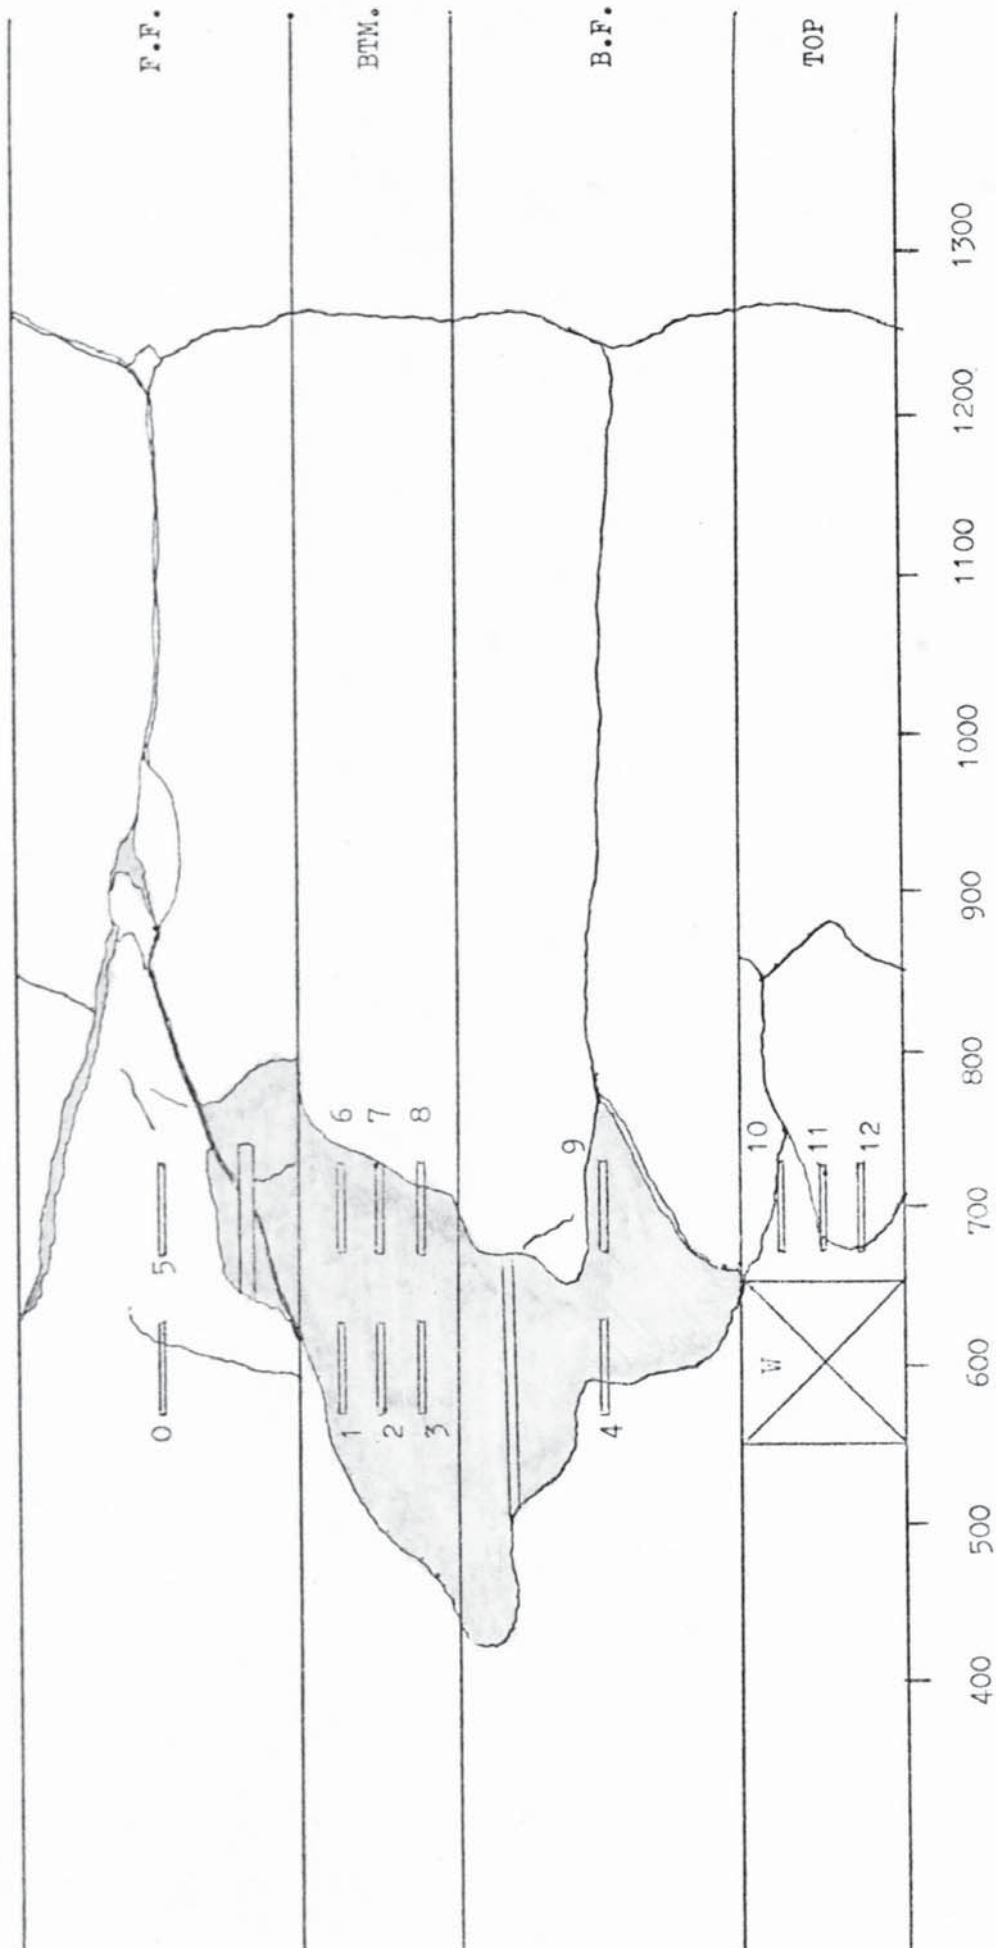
FAILURE CRACK PATTERNS - BEAM 32 ( MODE 1/2 )
